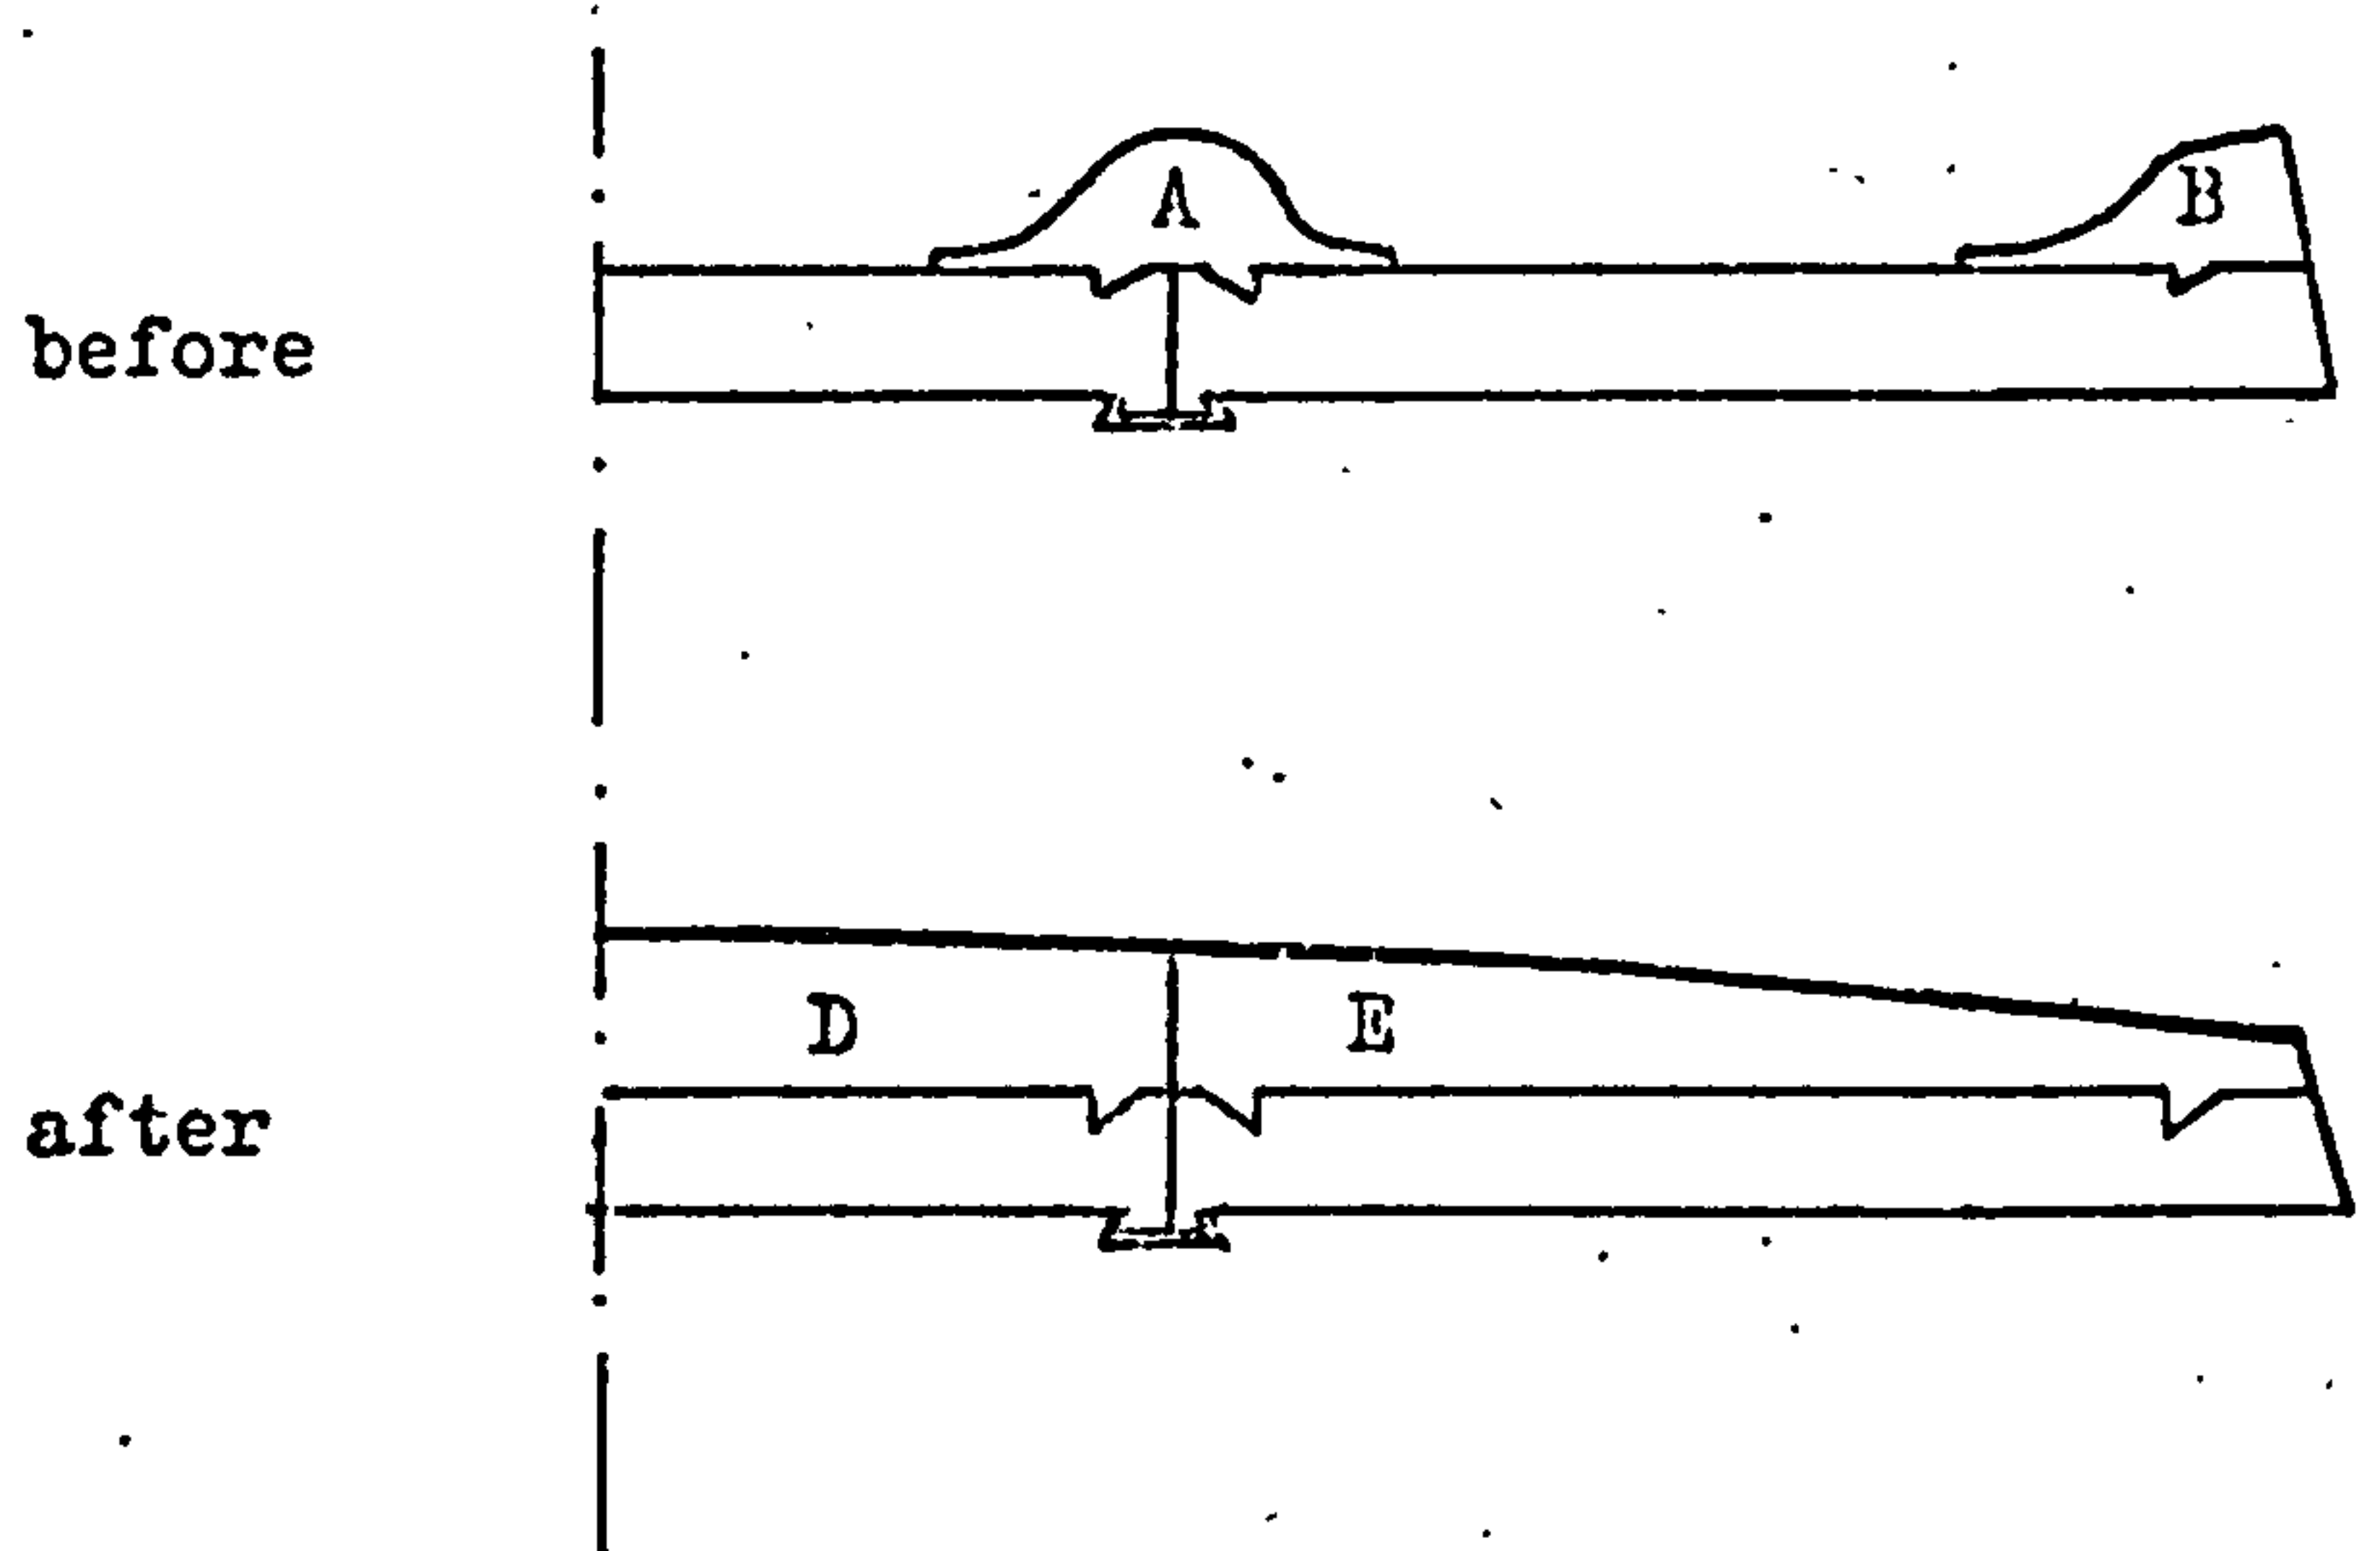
sketch of the modifying castings fitted to the Dee bridge girders.
